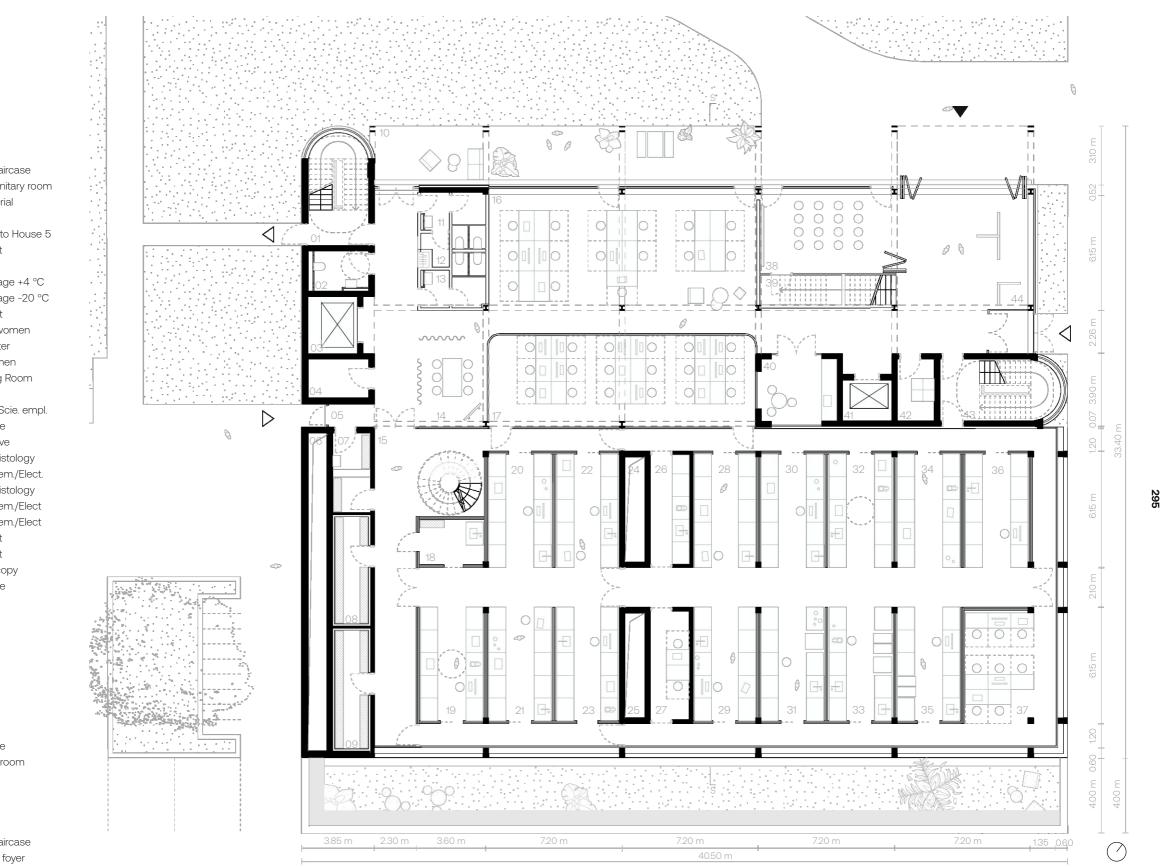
| Ground Floor | Floor plan | Scale 1:200
